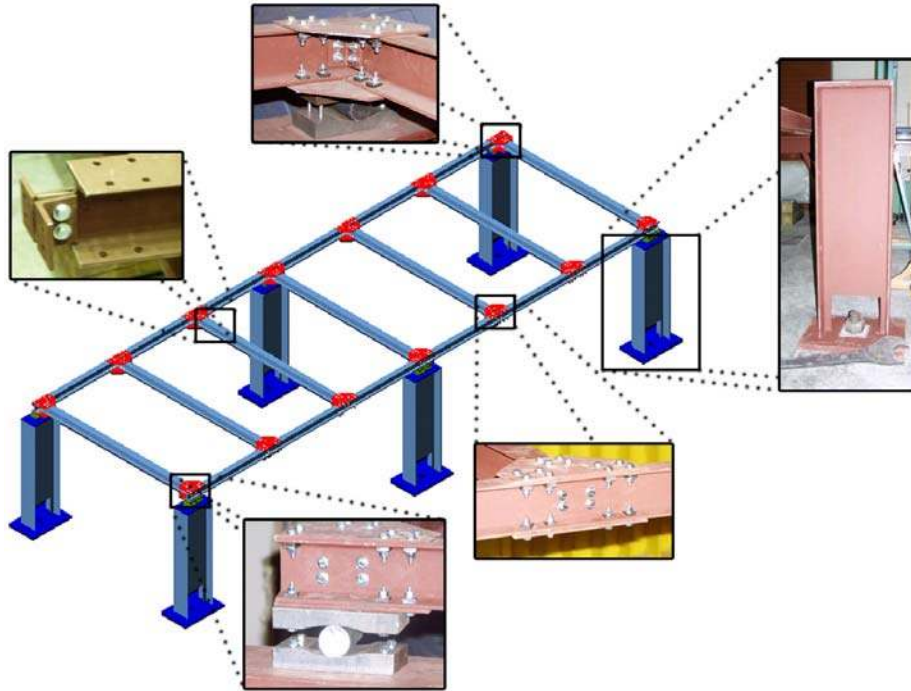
CAD drawing and representative pictures showing the details of the grid.
